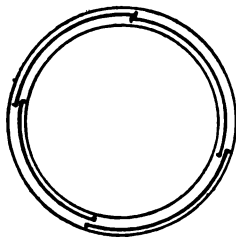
How to place reinforcing rods in a solid concrete silo.
